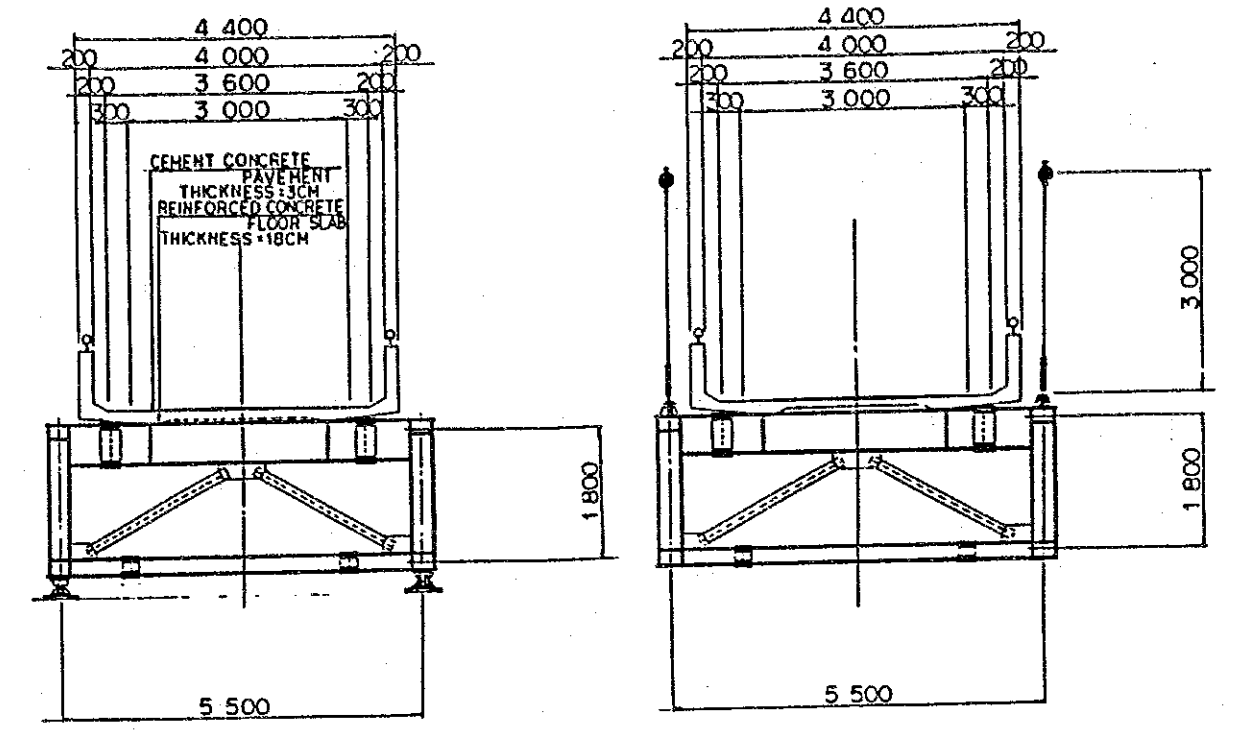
General Layout Plan of the No.19 Totakan Bridge
